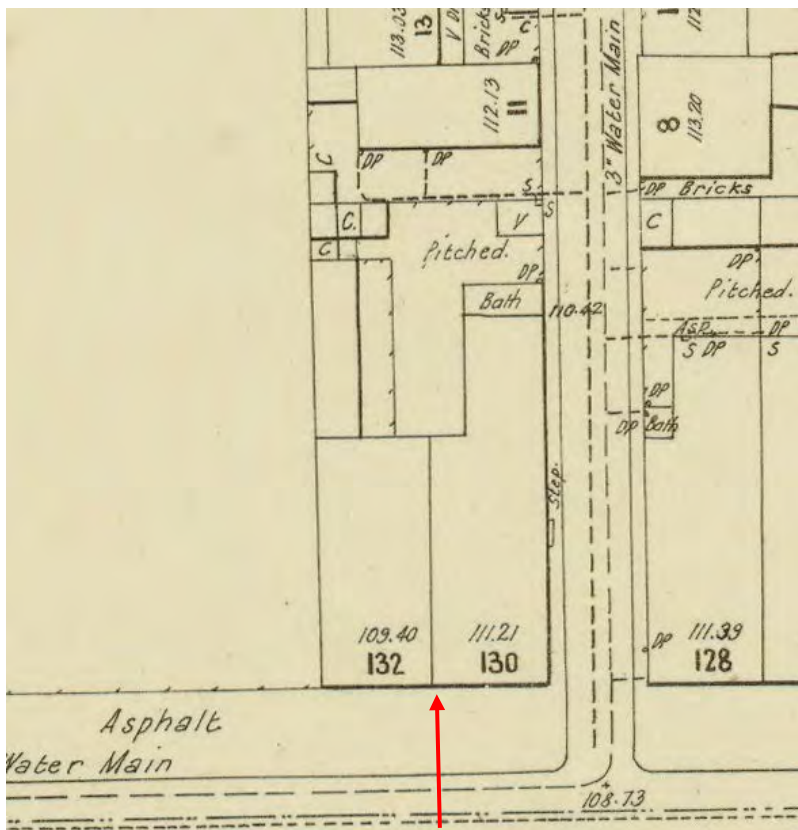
MMBW detail plan no. 1178, 1896, with nineteenth century buildings indicated. Note street numbering has since changed, and 144-146 Queensberry Street is shown as nos 130 and 132
